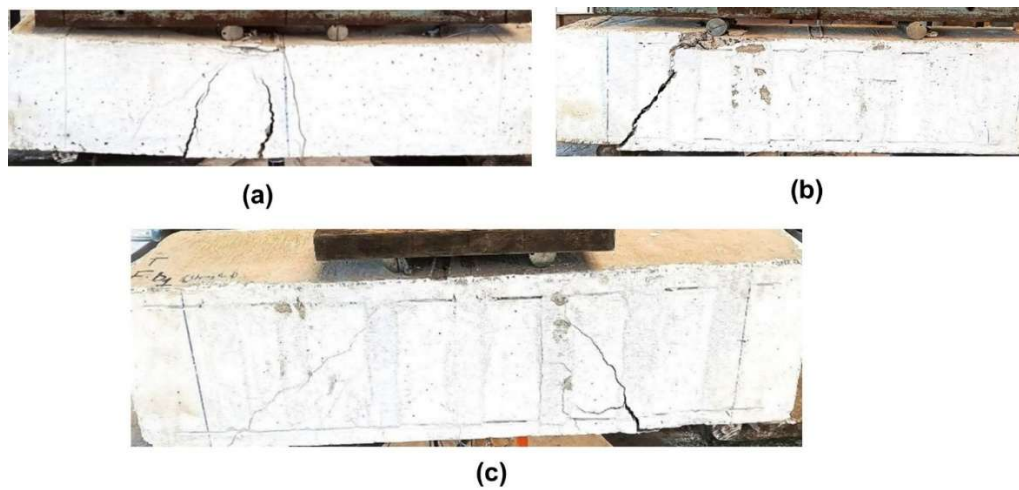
Failure modes and crack patterns. (a) Control specimen, (b) B-Pld and (c) B-Str.
